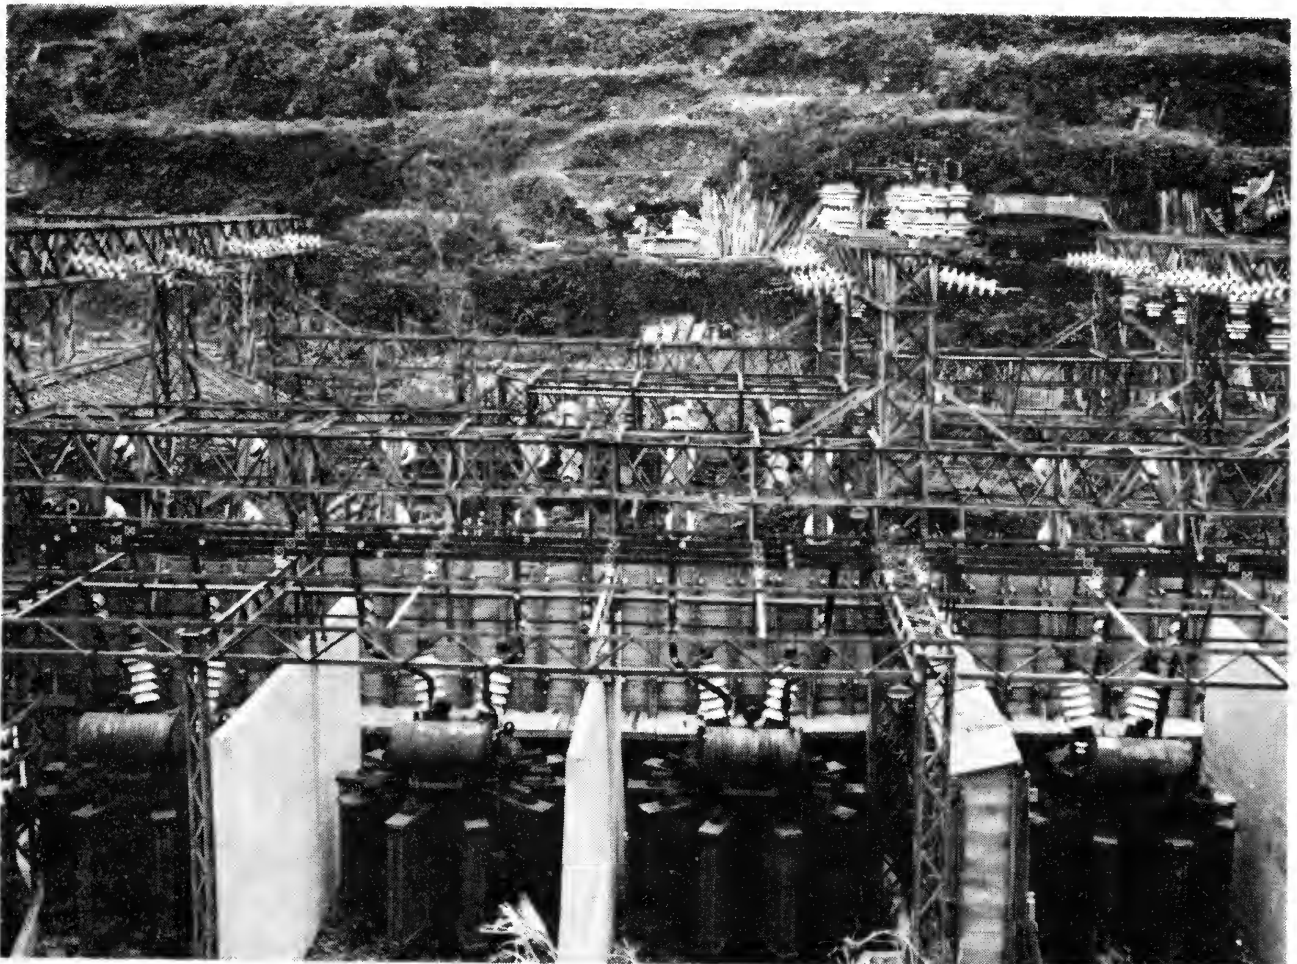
Reinforced-concrete blast walls protecting transformers (1 mile from ground zero at Nagasaki).
